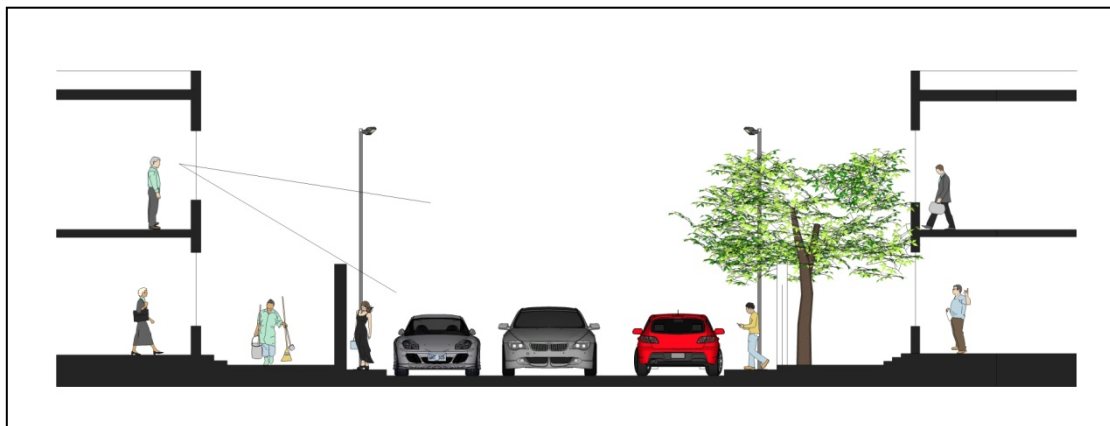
A typical cross-section demonstrating the interaction between public and private spaces in the Garden City
